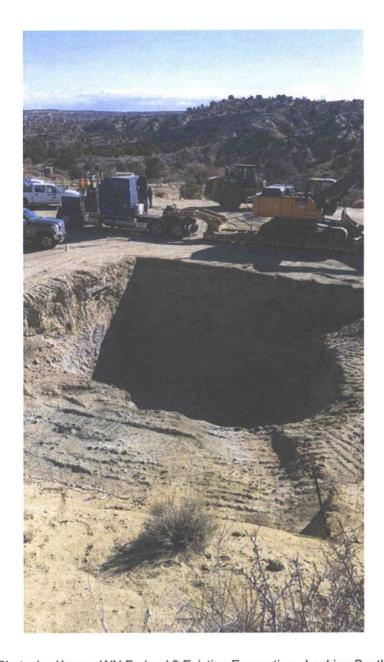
Krause WN Federal 2 Existing Excavation. Looking South.
